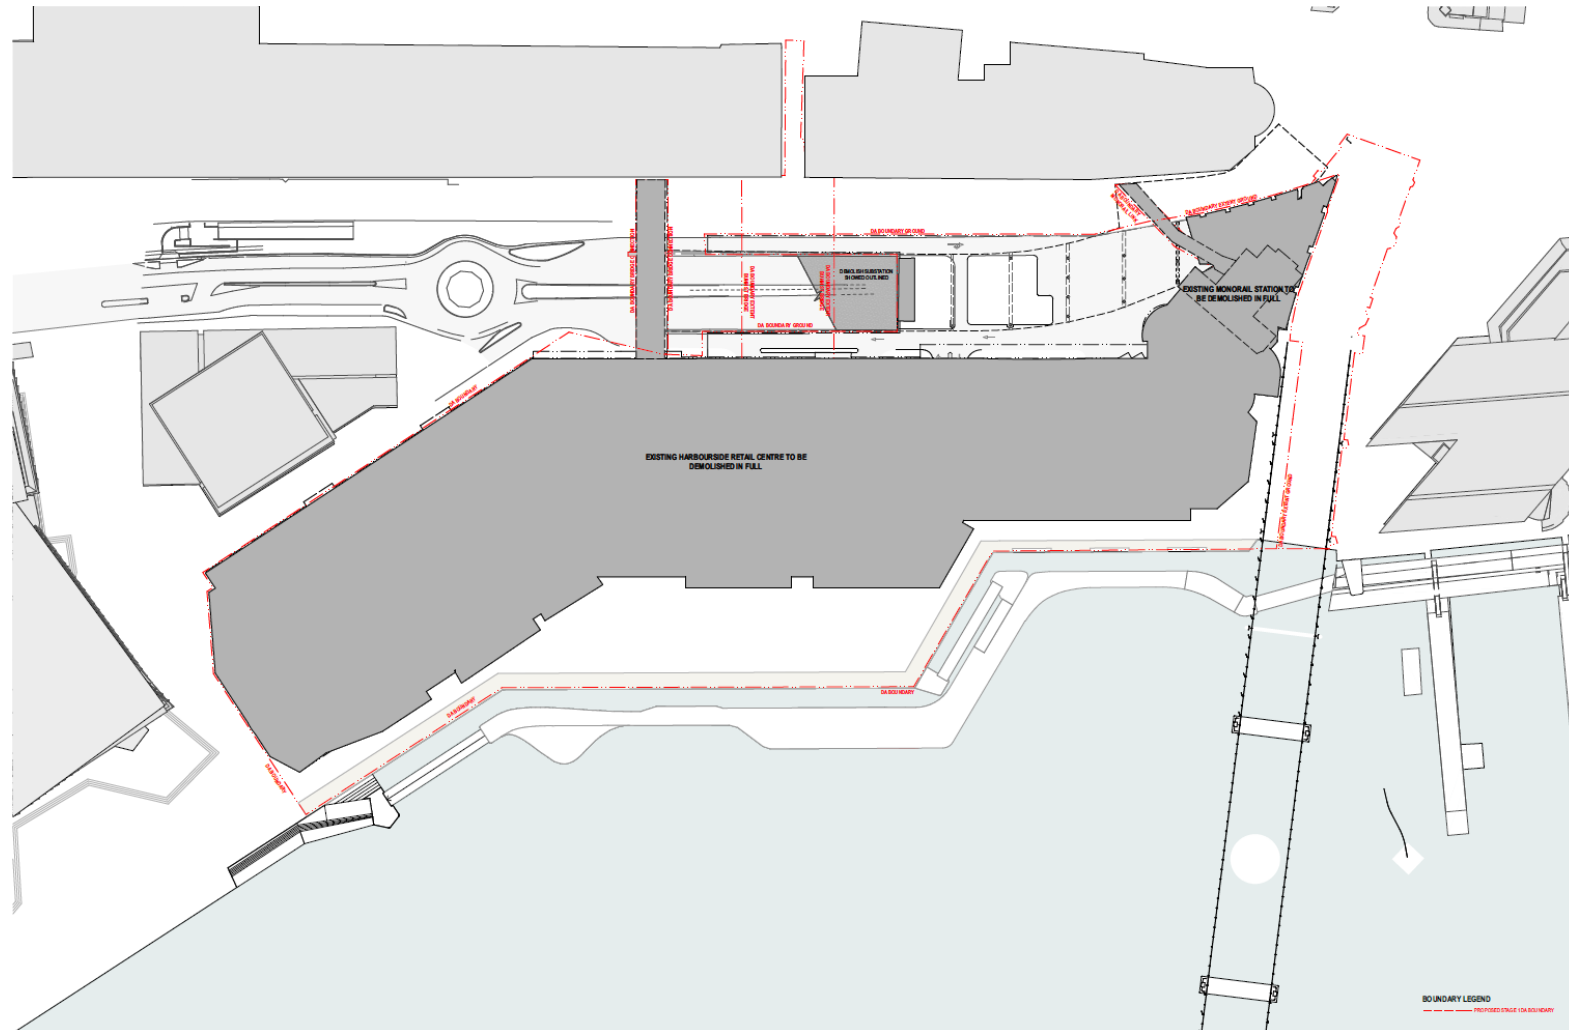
Demolition Plan (Source: FJMT, 2020)
